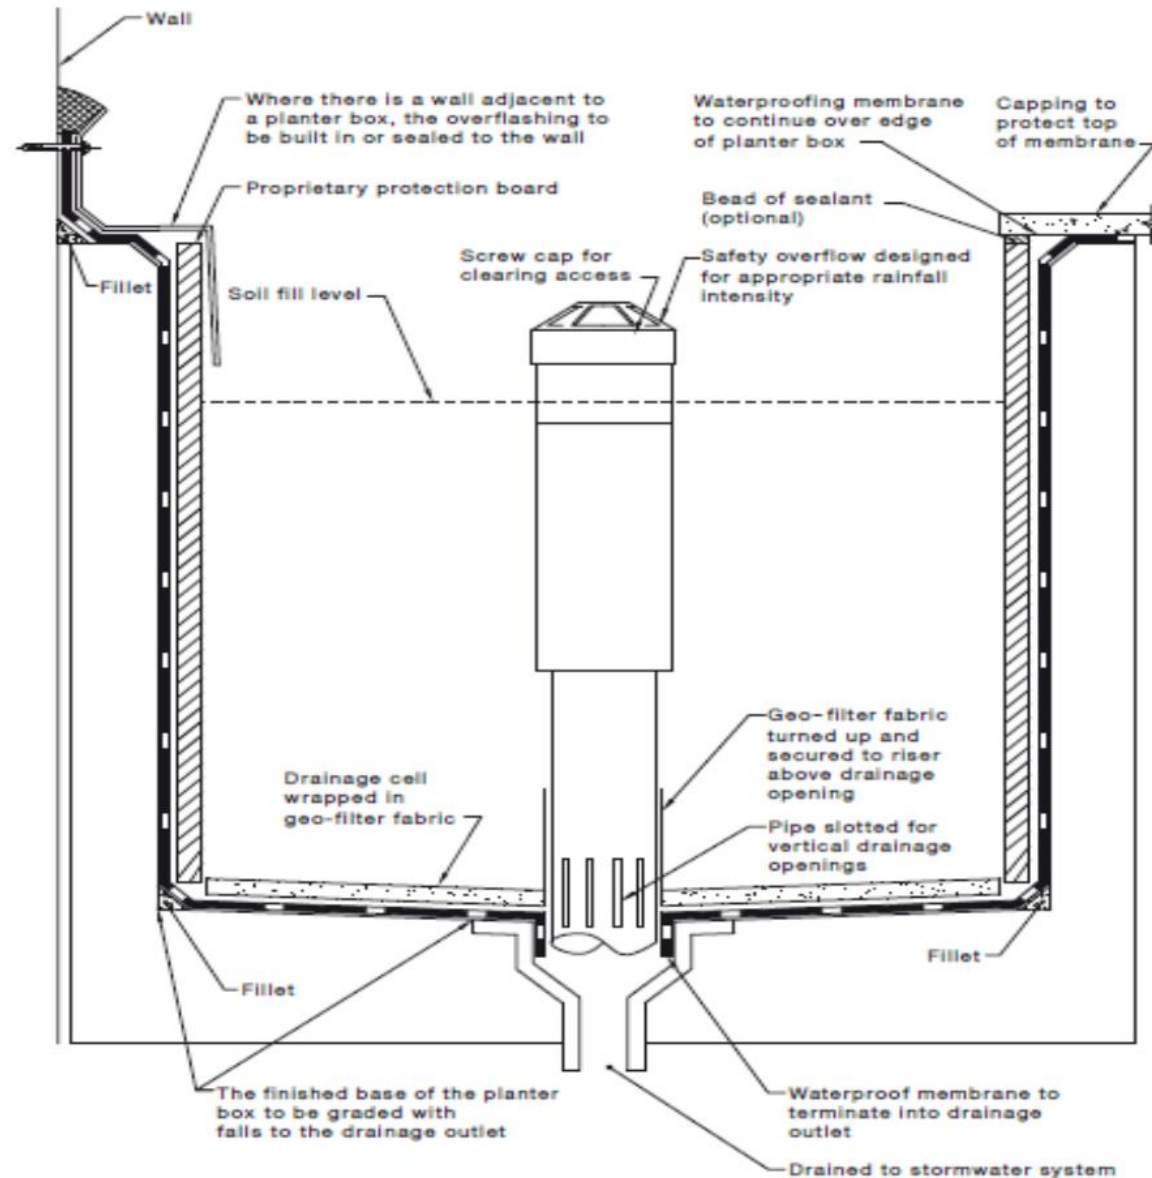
TYPICAL PLANTER BOX CONSTRUCTION
